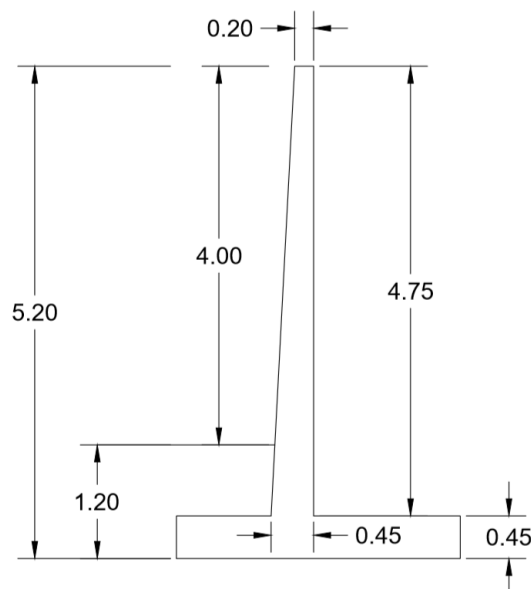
Cantilever retaining wall (Thickness of base slab)
